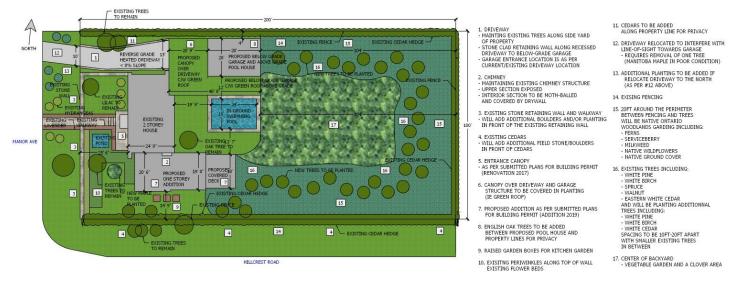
Site plan of the proposed development illustrating the unsevered lot, the existing and proposed built and landscape form. A one-storey addition with a covered deck extends along Hillcrest Avenue. The proposed below grade garage with a one storey pool house in the rear side yard, and a proposed future in-ground pool. The driveway is curved to reduce visibility and will require removal of one tree. Source: Pool House and Garage Dwg. Set July 2022. Source: Arc Associates Inc.
